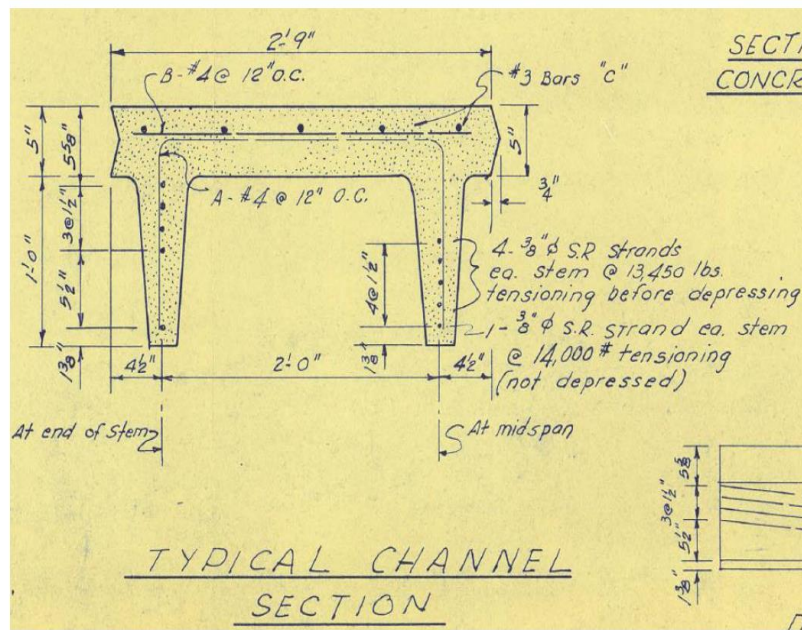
Typical Channel Cross-Section (SCDOT drawing)
